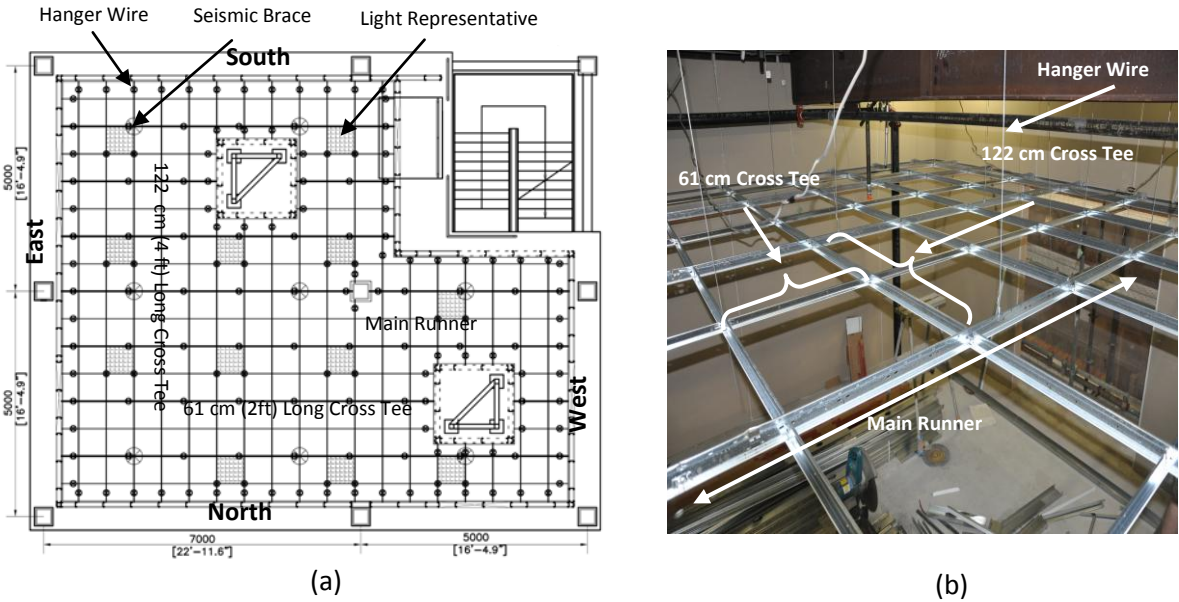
Overall view of ceiling system; (a) layout; and (b) photograph of grid prior to panel installation
